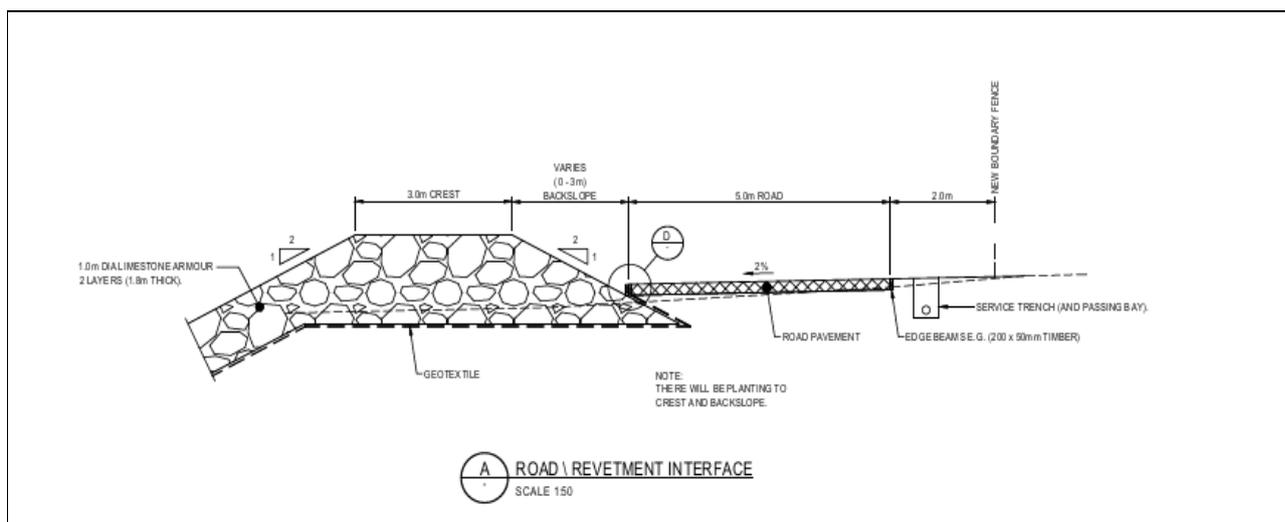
Cross-section of Revetment, Road and Passing Bay³
